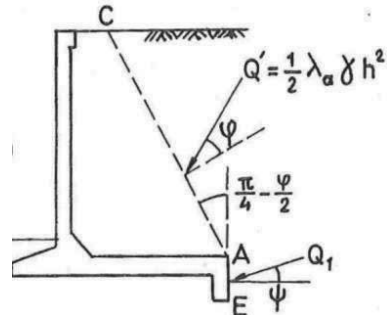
Alternative design rupture surface C-A-E of a L-shaped cantilever wall (after Vandepitte, 1979).
